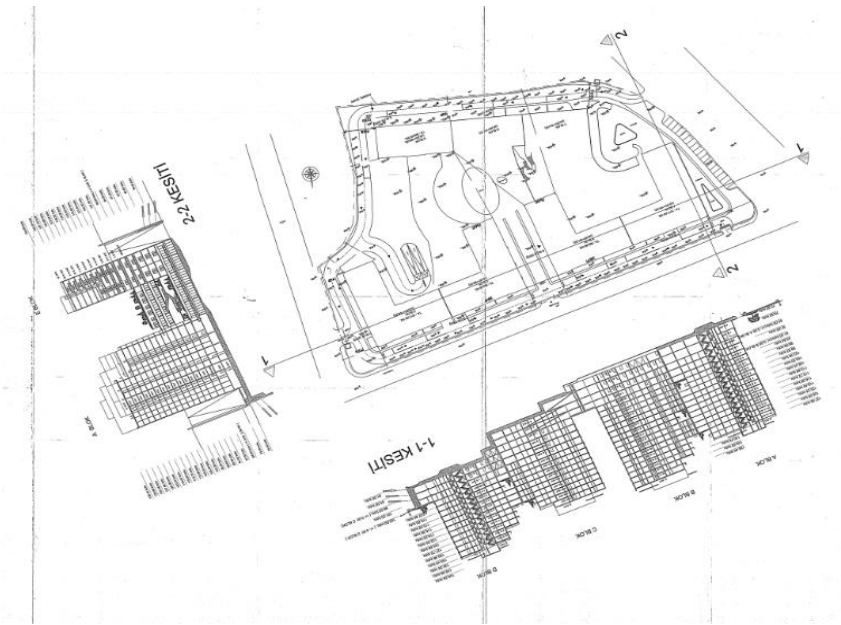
Site Plan showing the U-shaped building used to run the simulation
